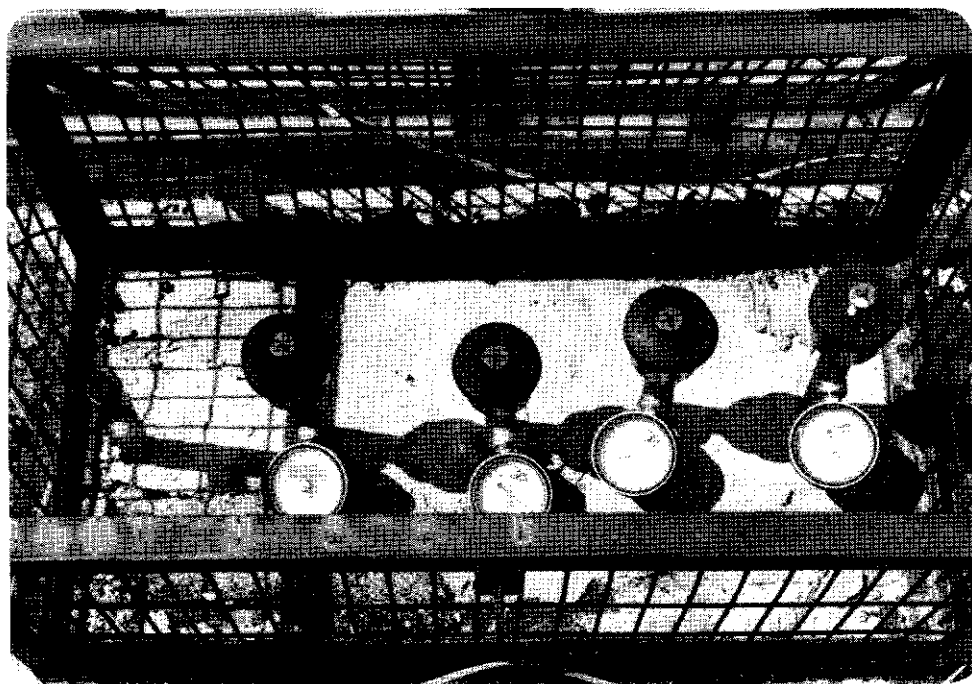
Jetfill tensiometers installed at location C on chunam slope (see figure 4.6).
